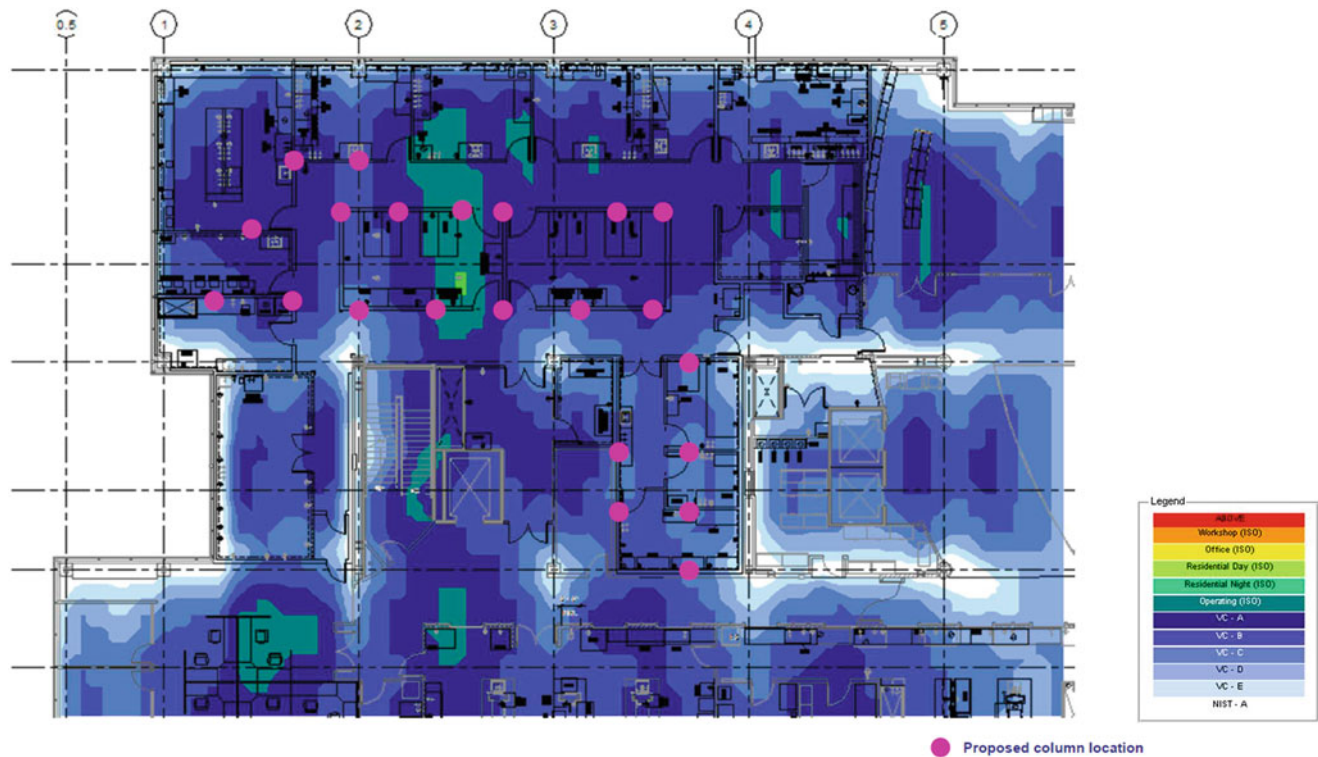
Predicted floor vibrations due to modified steel column layout
